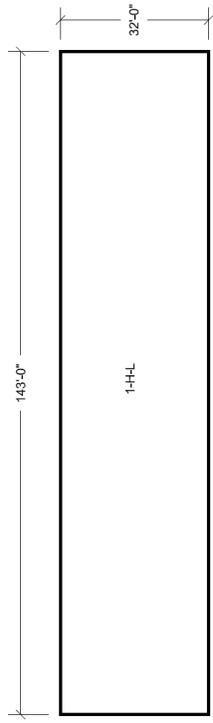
H.6-61: PUMP HOUSE SOUTH WALL LOOKING SOUTH
